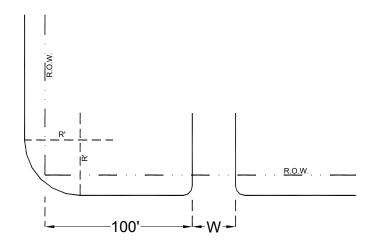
C ANGLE DRIVEWAY SPACING IN RELATION TO A CROSS STREET
